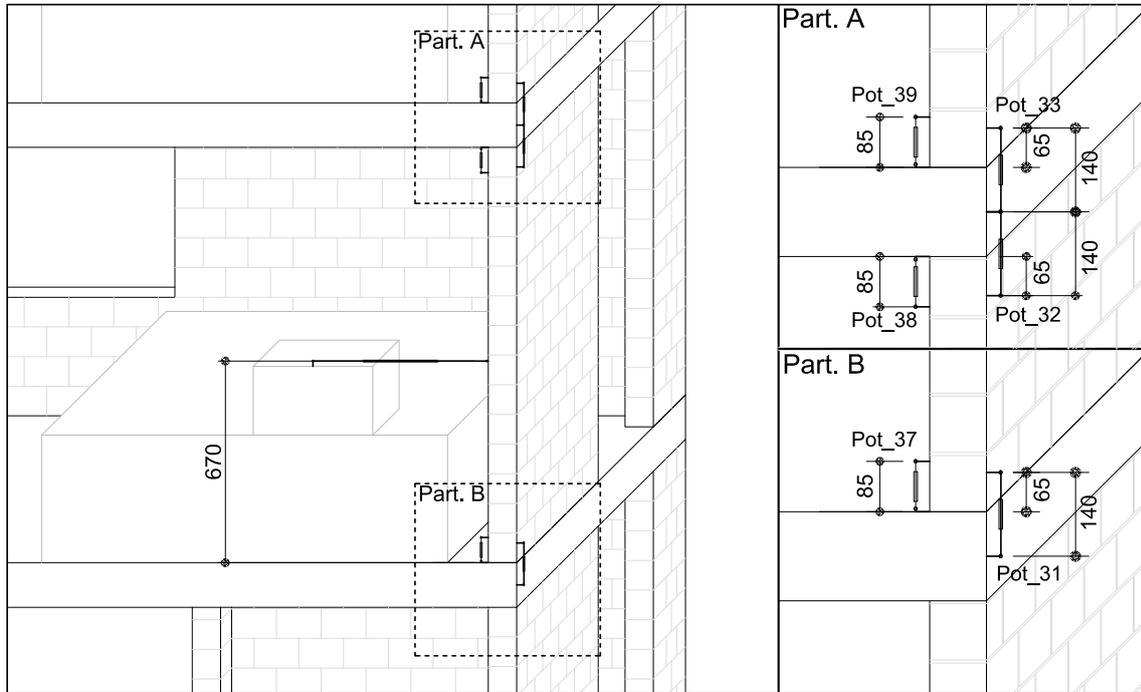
Potentiometers configuration for the measure of deformations of the 2nd storey out-of-plane loaded URM pier on the North face of the building, measures in mm.
